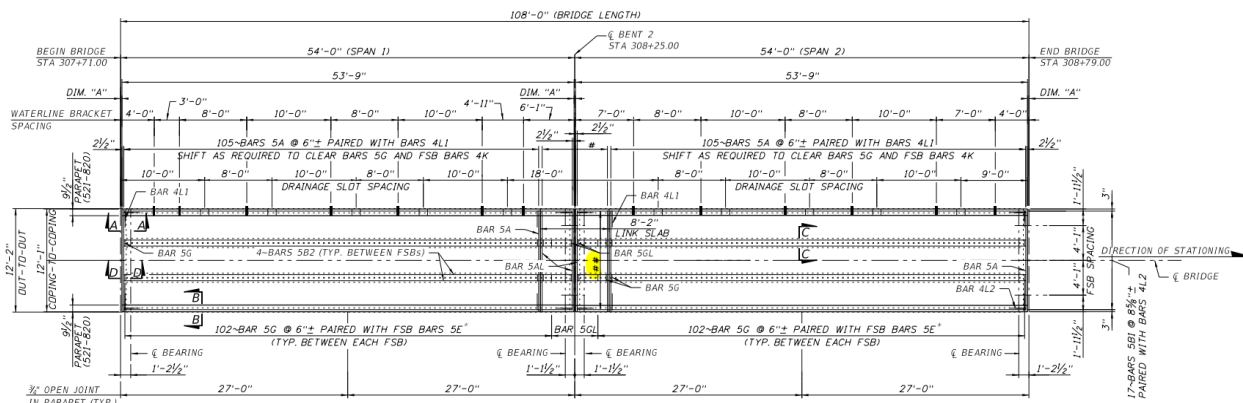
Elevation of the Bridge with the link-slab (Bridge No. 019003)
